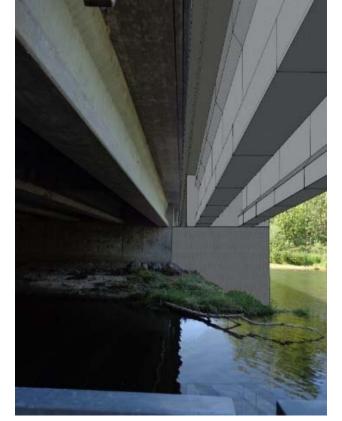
'After' rendering (right) - concrete beams attached to existing bridge, looking under the west side of the bridge
